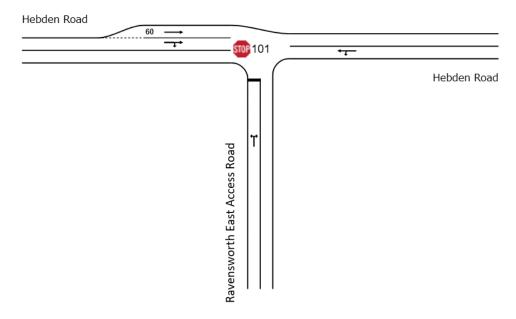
Hebden Road / Ravensworth East Access Road Intersection Layout
